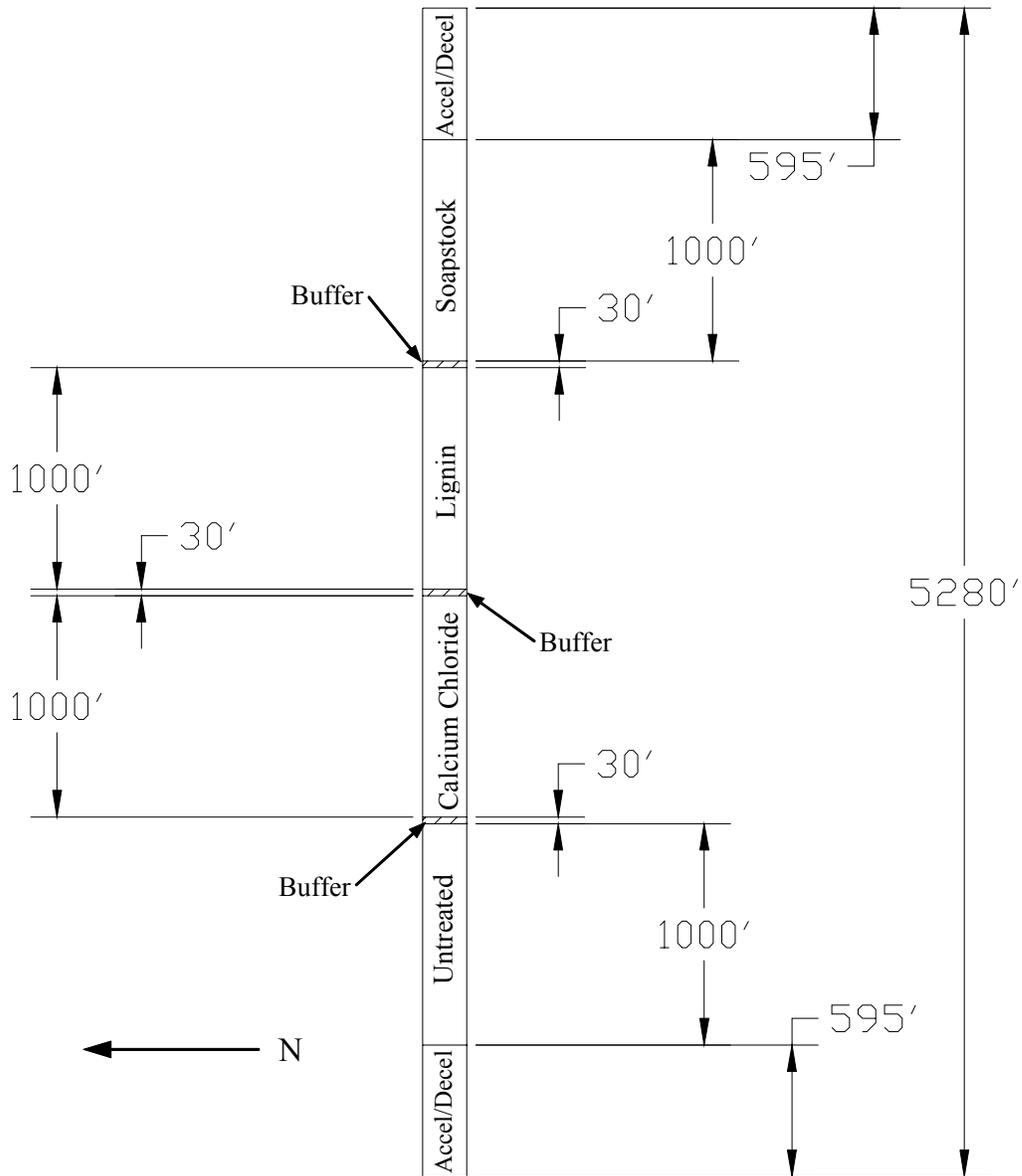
260<sup>th</sup> Street test section plan.
